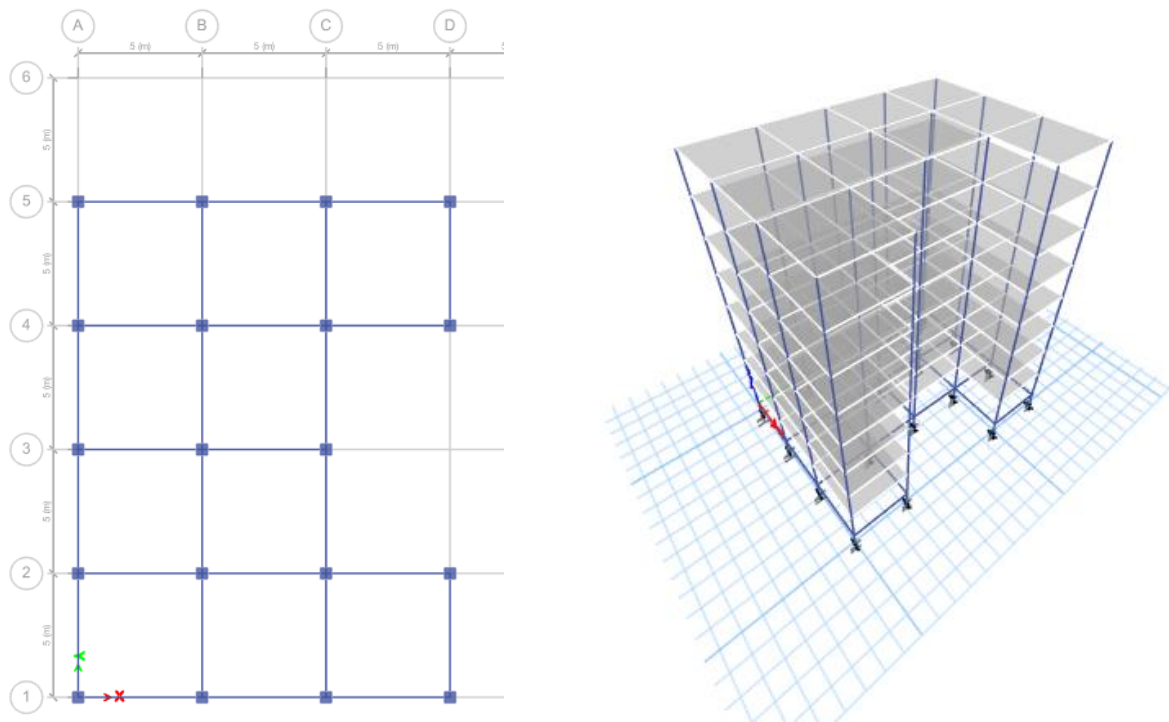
Views of C-shape building (a) Plan view, (b) 3D linear appearance
